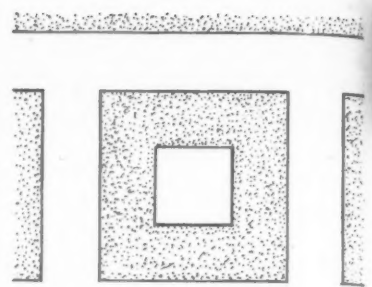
OLD BUILDING ON BOMBED SITE. Site 200 ft. by 200 ft. surrounded by streets 60 ft. wide. Height of all buildings 6 storeys = 60 ft. above point of reference.
